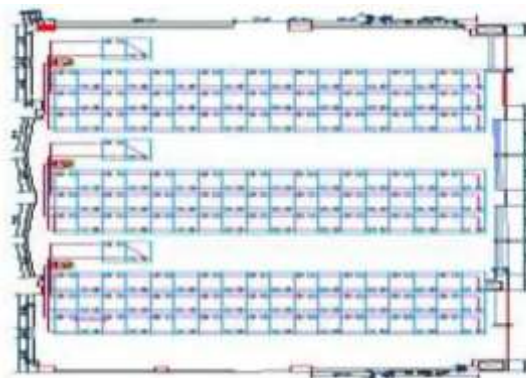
Design Layout of Ahsanullah university Block rooftop by AutoCAD.
